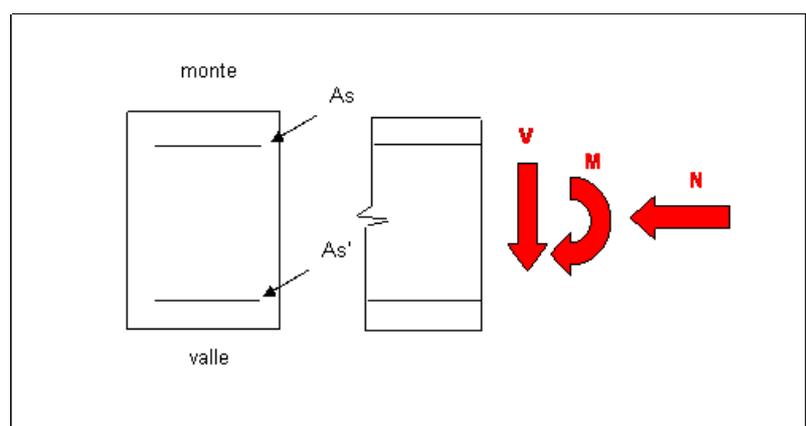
Scheme of the actions that act on the foundation of the elevation wall of the dam (in the pre-burying conditions).
